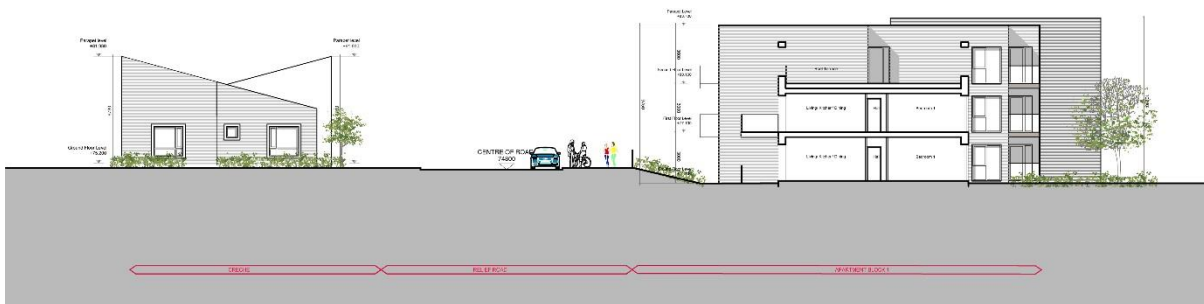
Cross Section through Apartment Block 3 and Link Road. Creche on opposite (western) side of link road shown in context. Section is taken through the 2 storey element of Block 3
